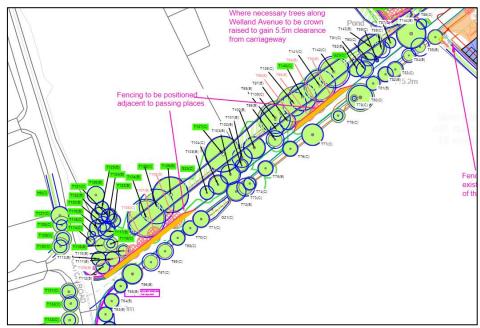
Plan indicating trees provision of passing bays on Welland Avenue
